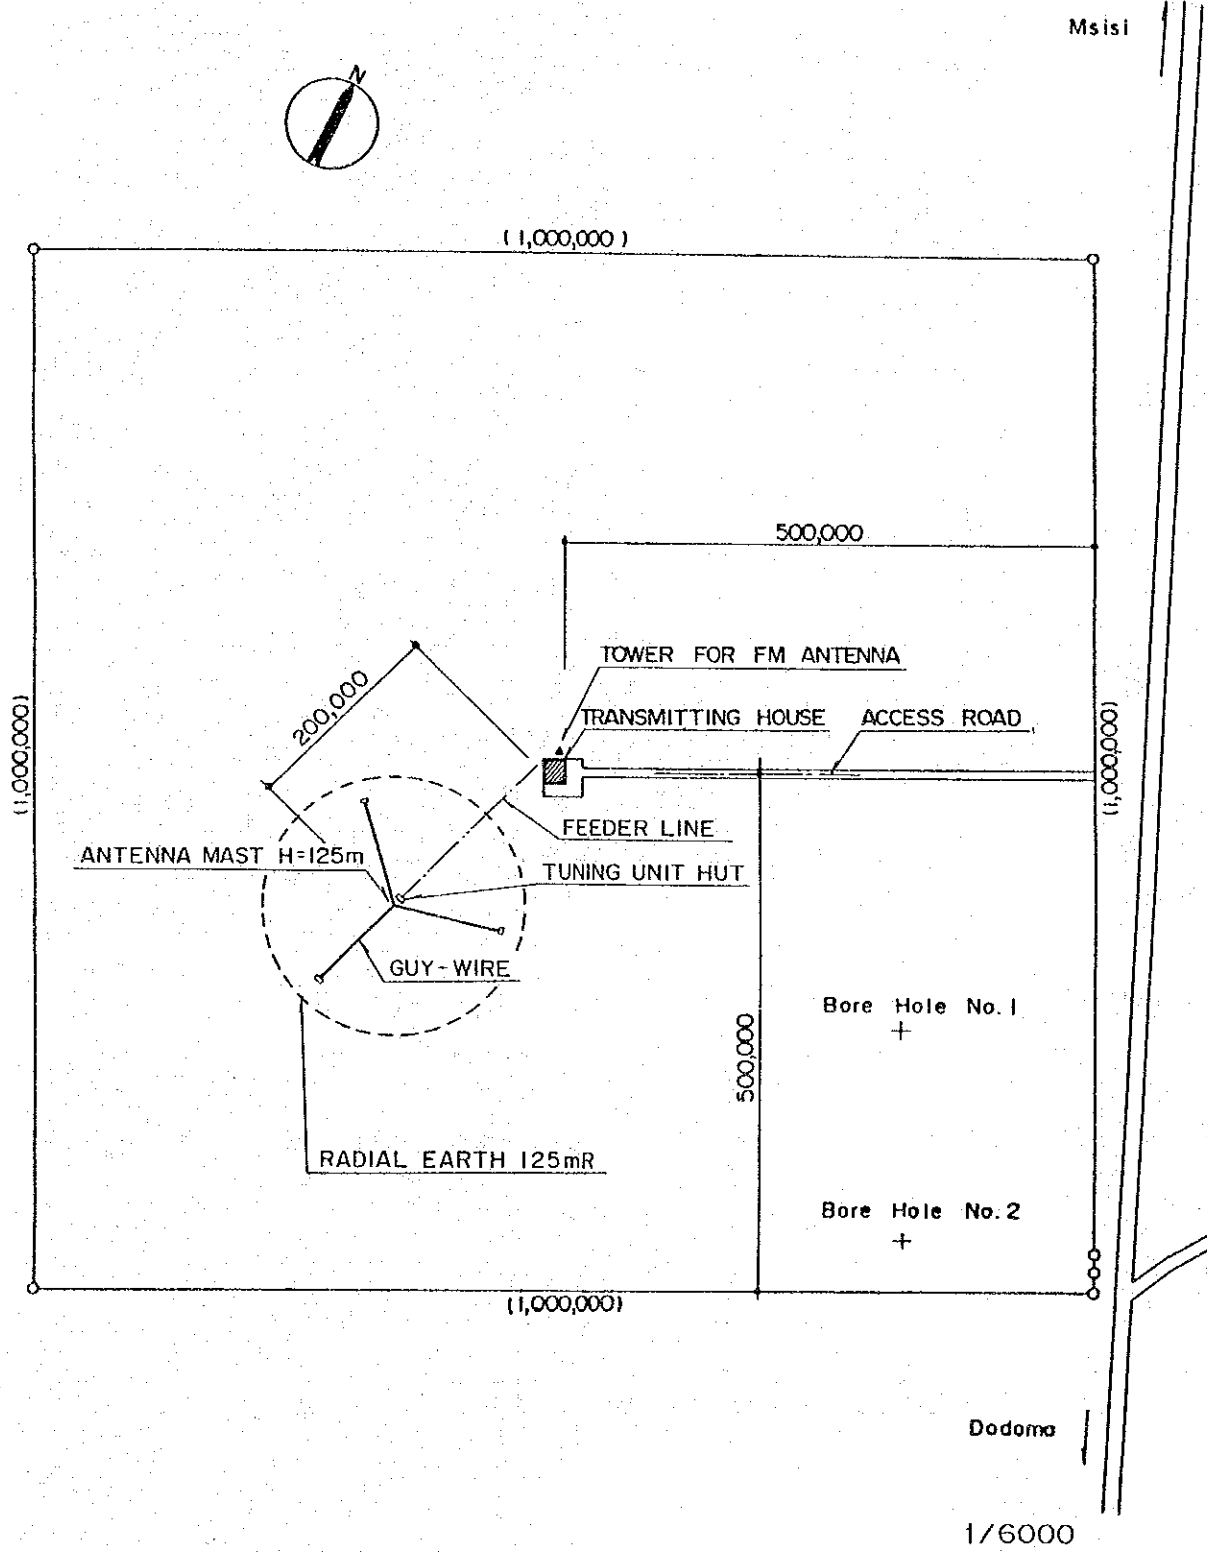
SITE PLAN OF DODOMA TRANSMITTING STATION
